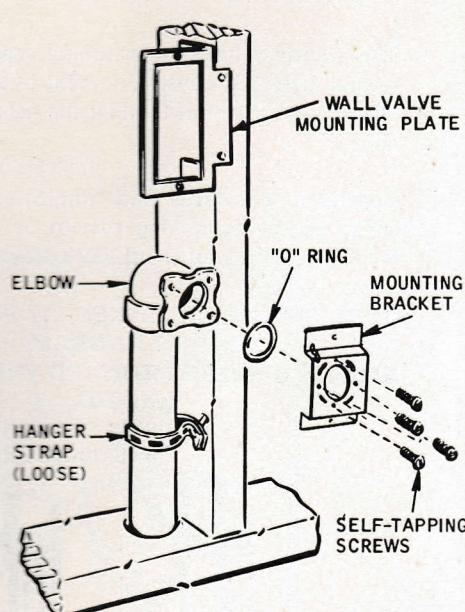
SECURING TUBING AND MOUNTING BRACKET.
